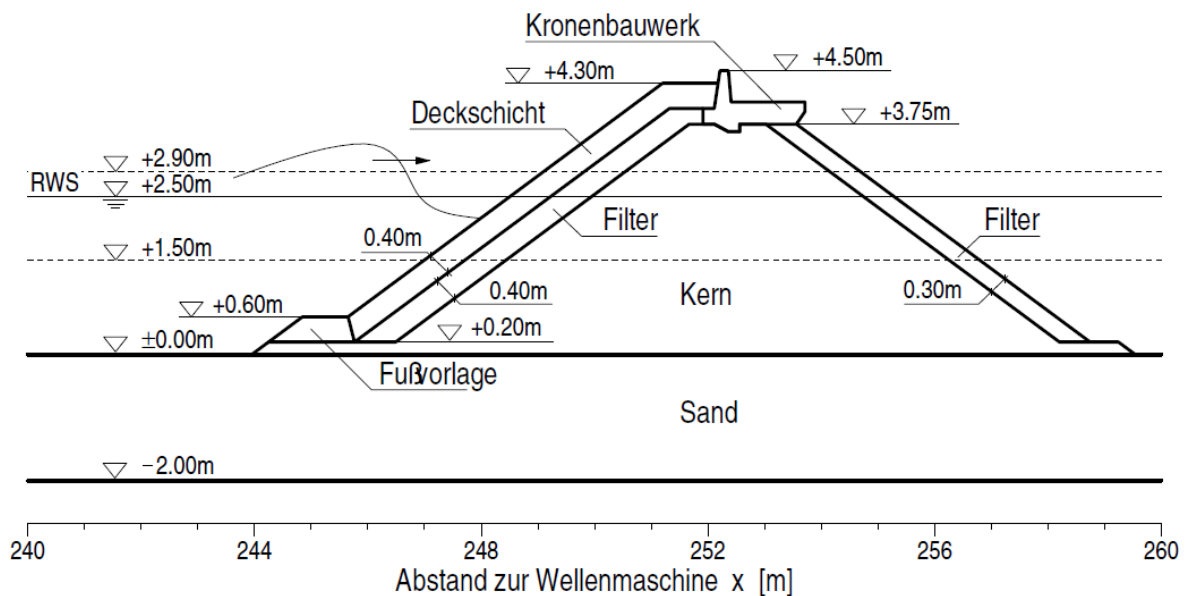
Schematic cross-section of the breakwater construction of (Muttray, 2000)
